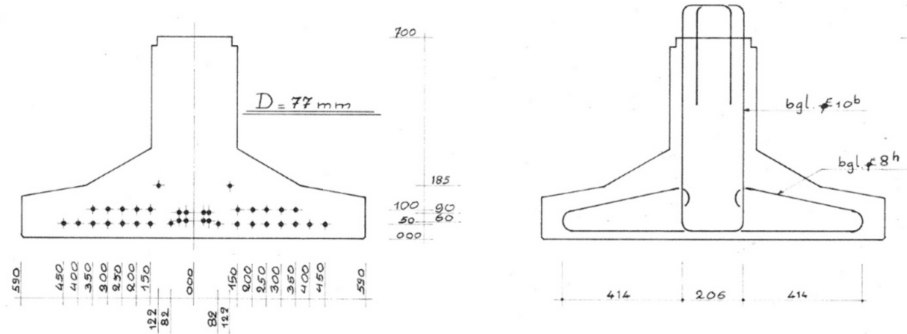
Prestressing strands ($36 \times 12.7 \text{ mm}$) (left) and reinforcement (right) in girder from 1980
